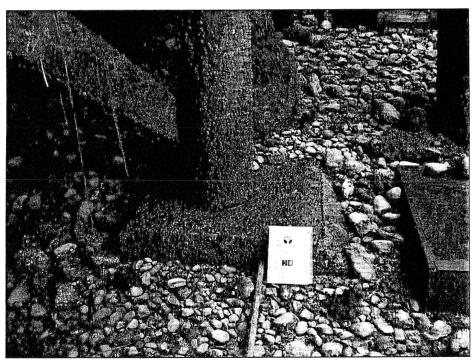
View of existing pile upon cast in place concrete footing immediately adjacent to the subject property. Note that barnacles have colonized and have higher densities than adjacent cobbles.
